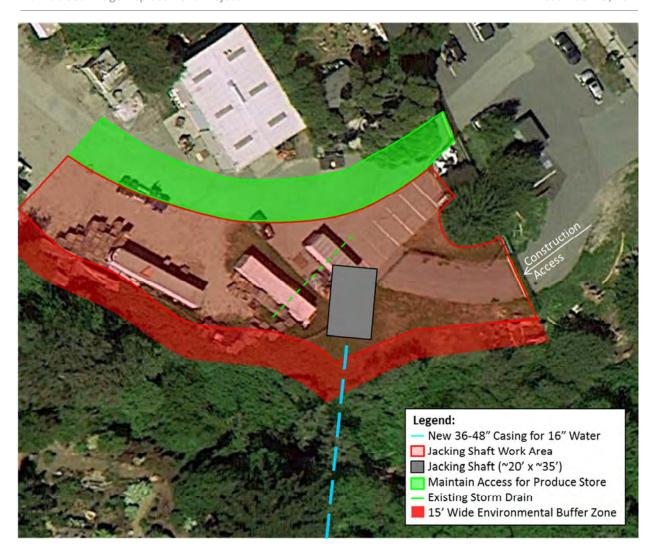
Jacking Shaft Location and Proposed TCE North of Pilarcitos Creek
